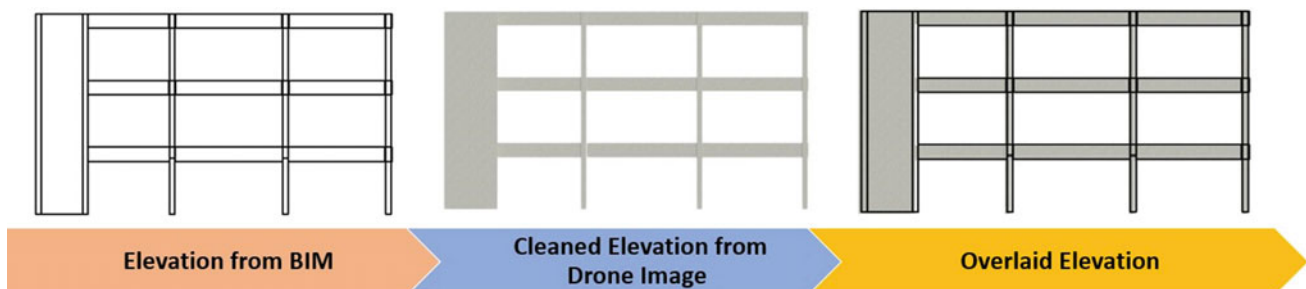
An example of overlaying elevation from BIM to the elevation from Drone Image
